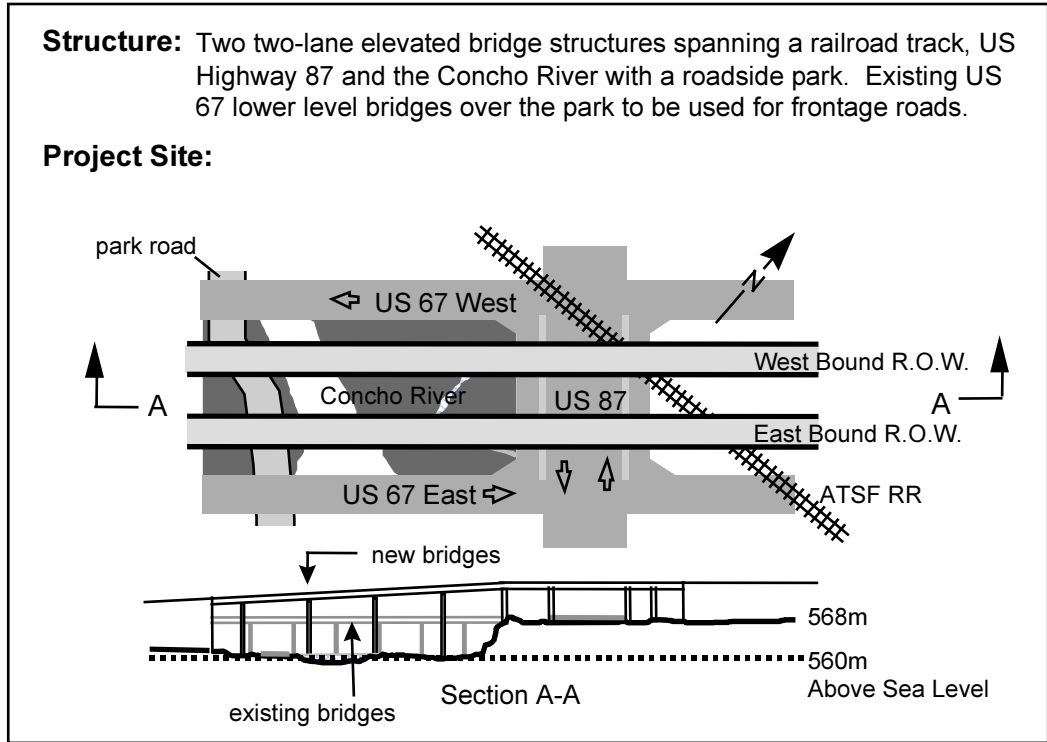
Site plan and section showing location of the future US 67 mainlanes
